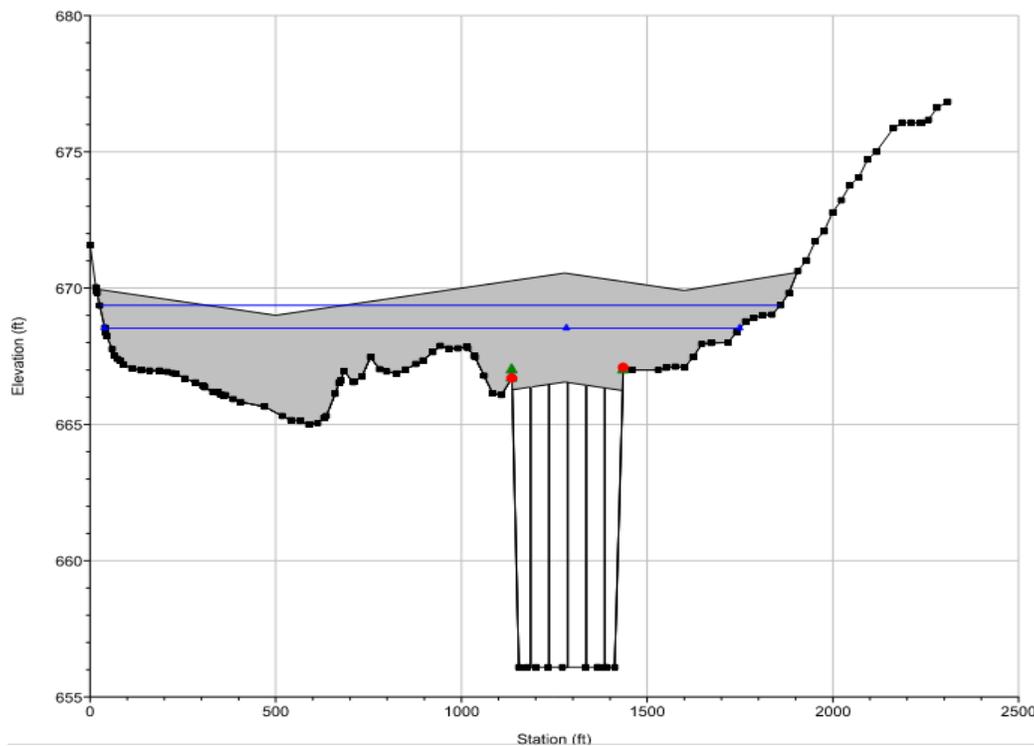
Proposed 300-foot Alternative 2 bridge improvements at Fox Lane.
